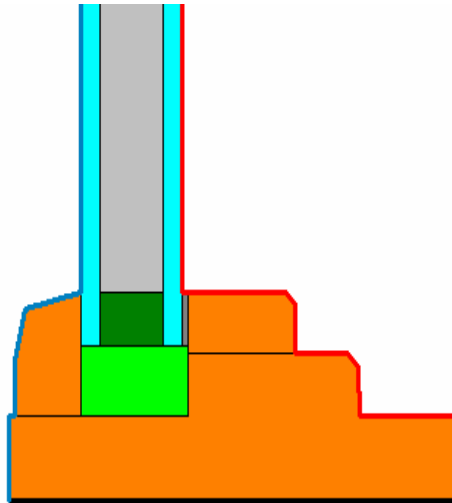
Sill cross-section views of Wood windows in THERM
